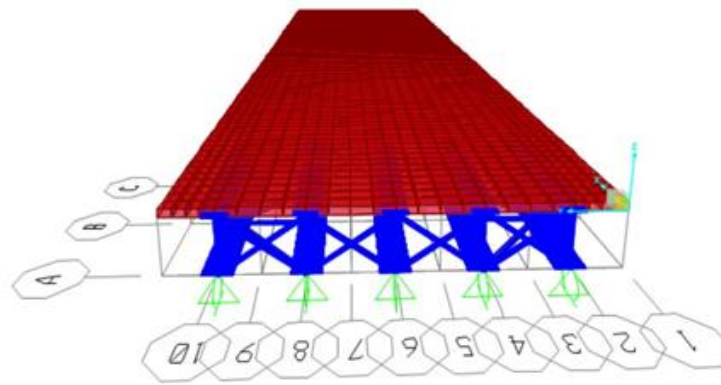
Cross-section of the composite plate girder bridge with mesh
